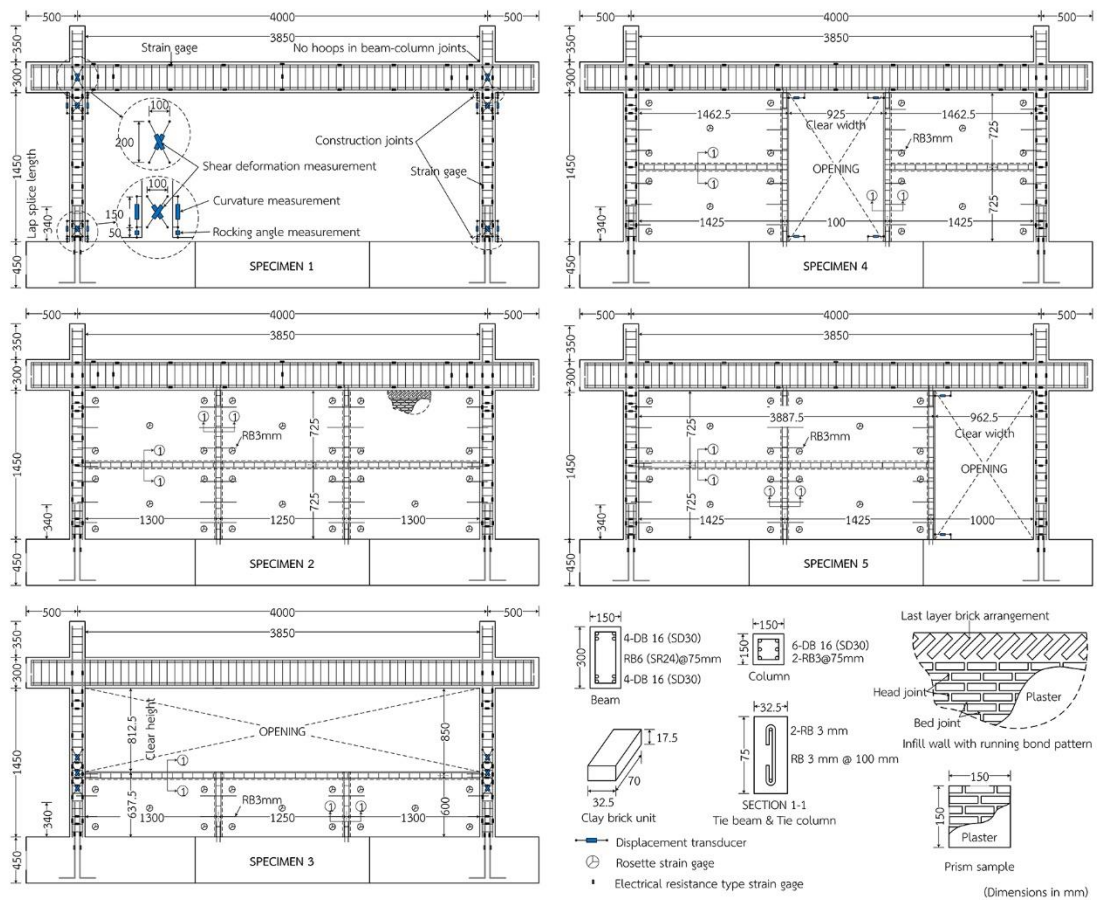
Structural details and instrumentation of test specimens (dimensions in mm)
